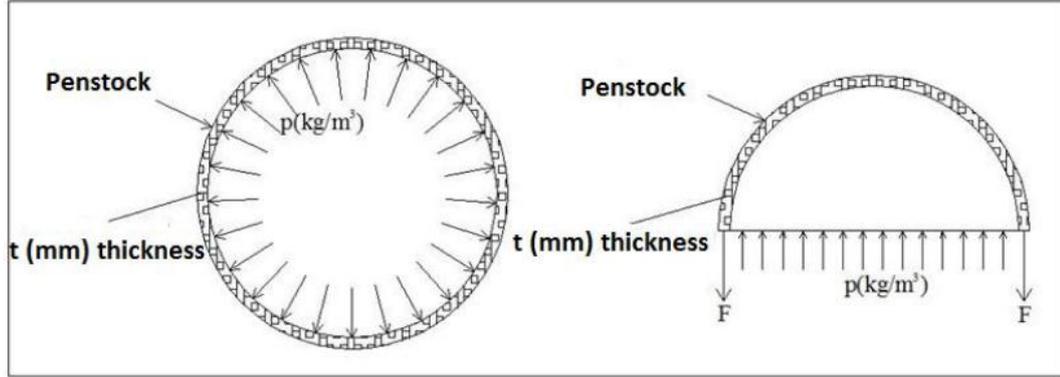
Penstock Cross-Section and the Forces and Pressures on it (Calamak, 2010)
